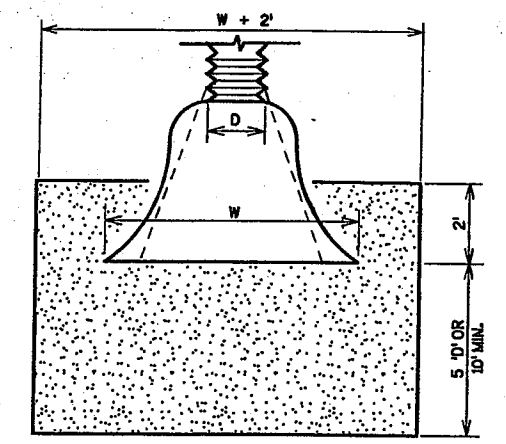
DETAIL FOR EXCAVATION BELOW SUBGRADE - CTH CB
